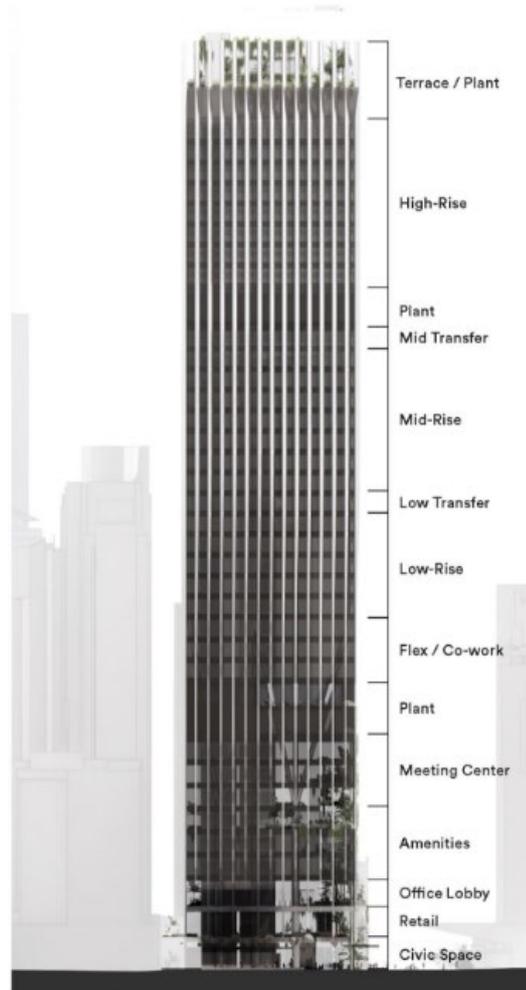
Proposed Elevation (By Henning Larsen/Architectus)
